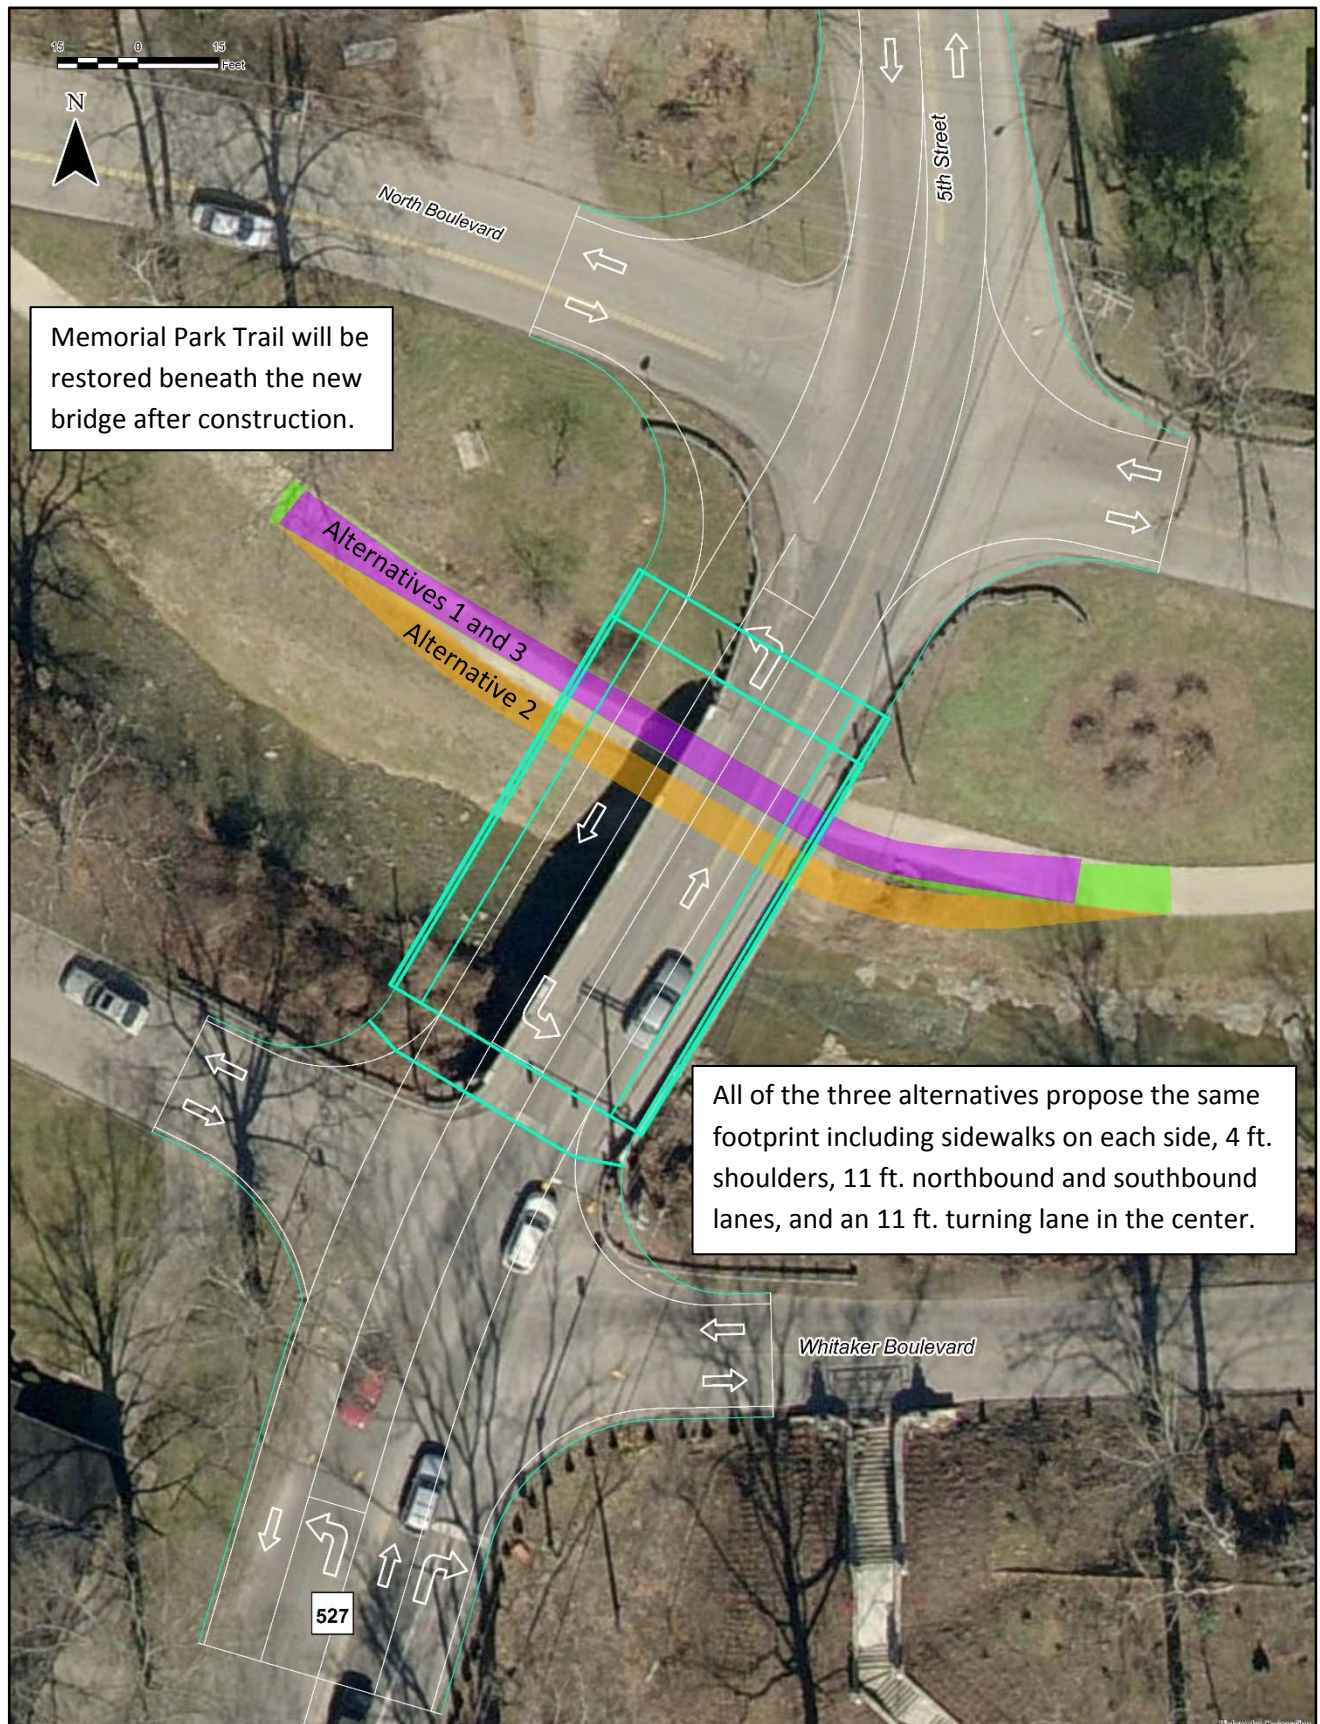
The proposed future location of the trail with each of the 5th Street Bridge alternatives.
